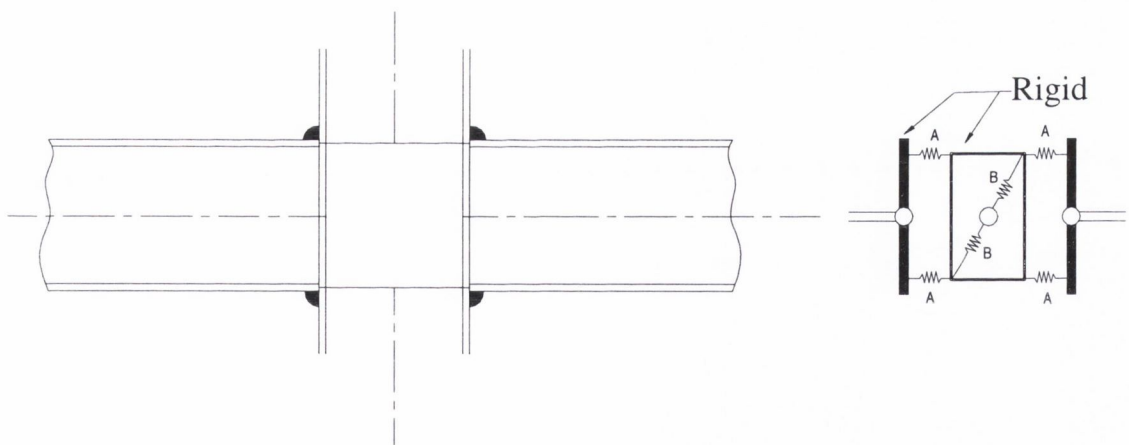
Mechanical Model of a Full Welded Joint (Tschemmerneegg, 1988)
